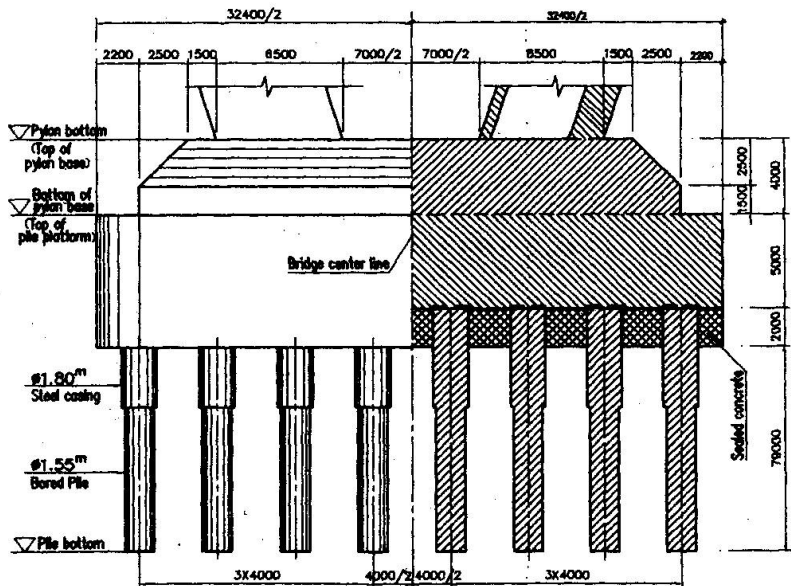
Cast-in-situ bored pile foundation with suspended box cofferdam
